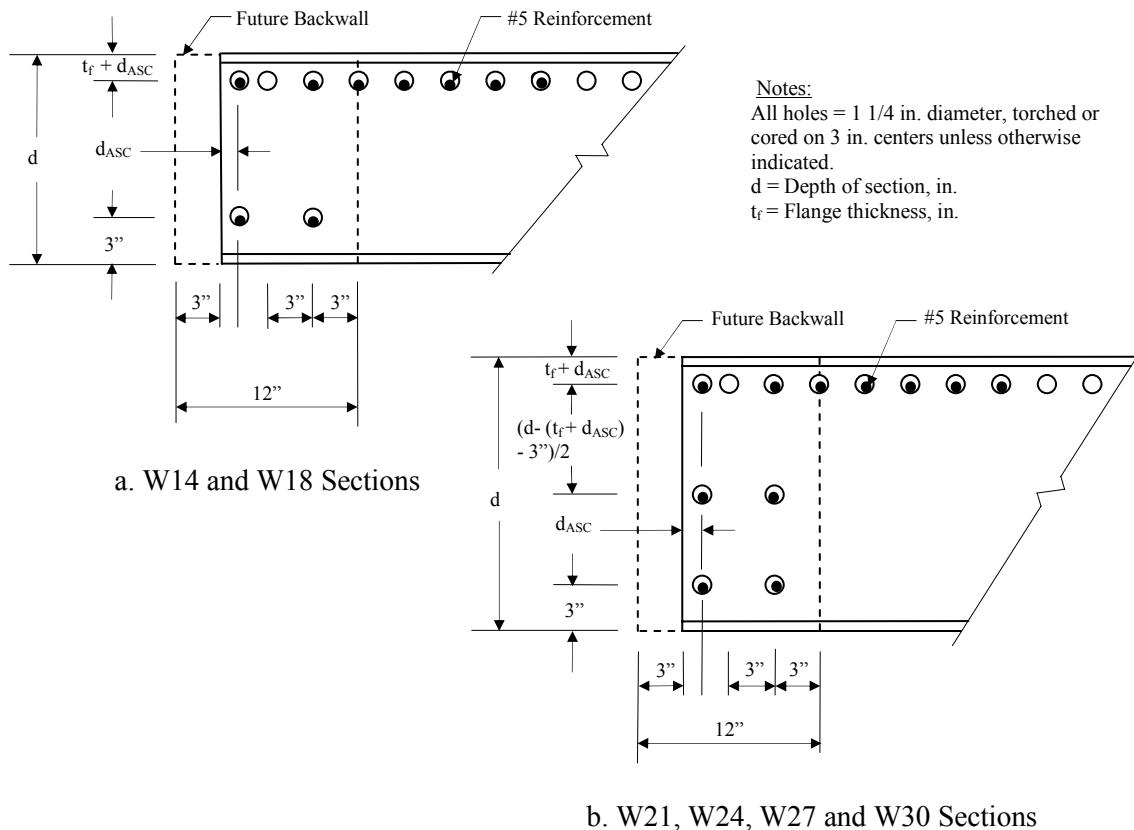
Layout of backwall reinforcement for future MBISBs.
